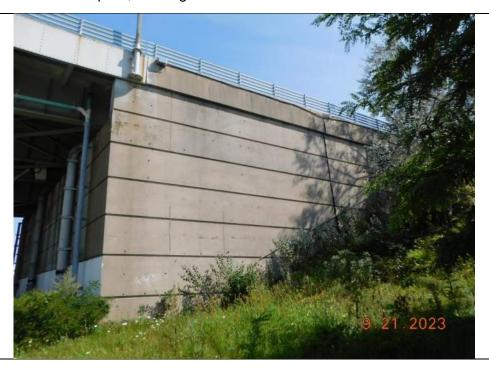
[South Abutment] -Abutment West wingwall, Looking Southeast
